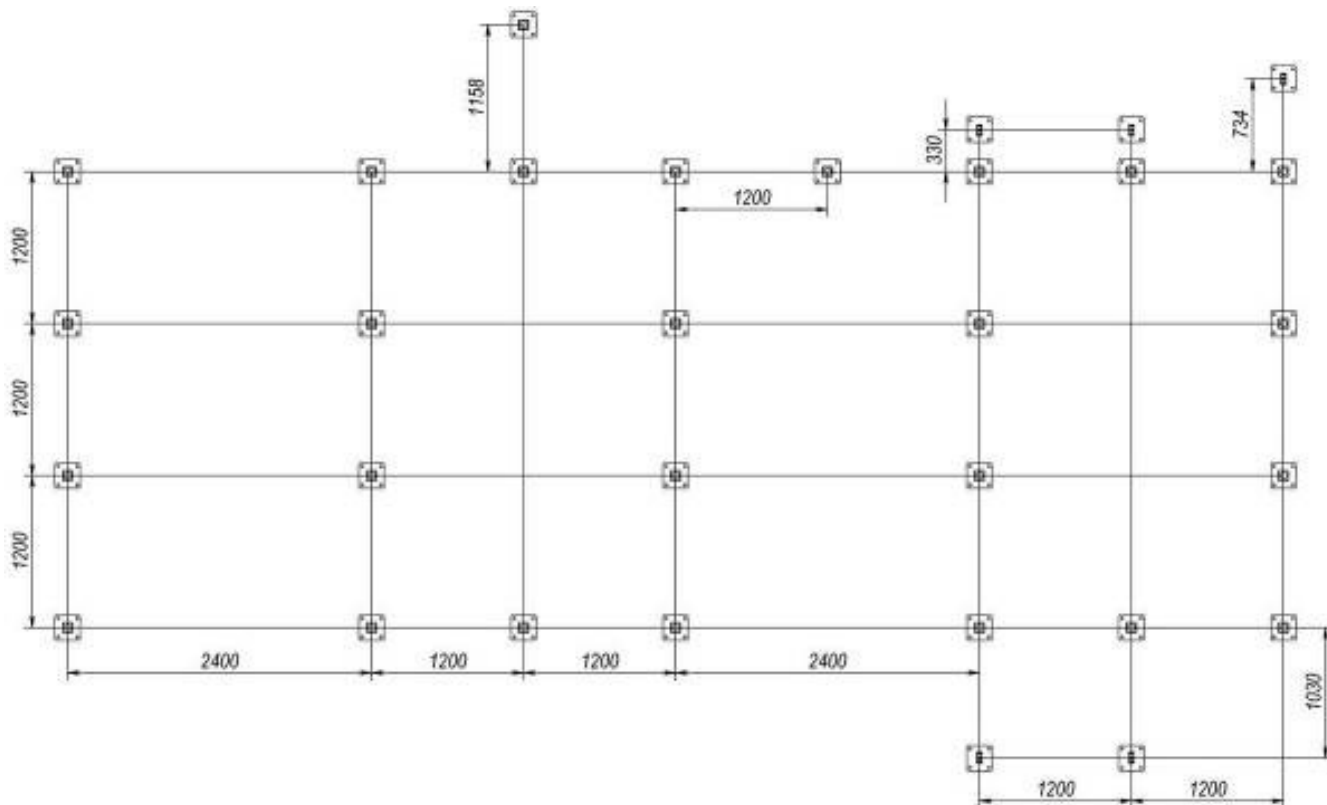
Assembly scheme (Identical assembly scheme for KF902.10, KF902.11, KF902.12, KF902.13, KF902.14, KF902.16, KF902.17, KF902.18, KF902.19, KF902.21, KF902.22, KF902.23, KF902.24, KF902.25, KF902.26, KF902.31, KF902.51) See the additional assembly scheme in appendix.
